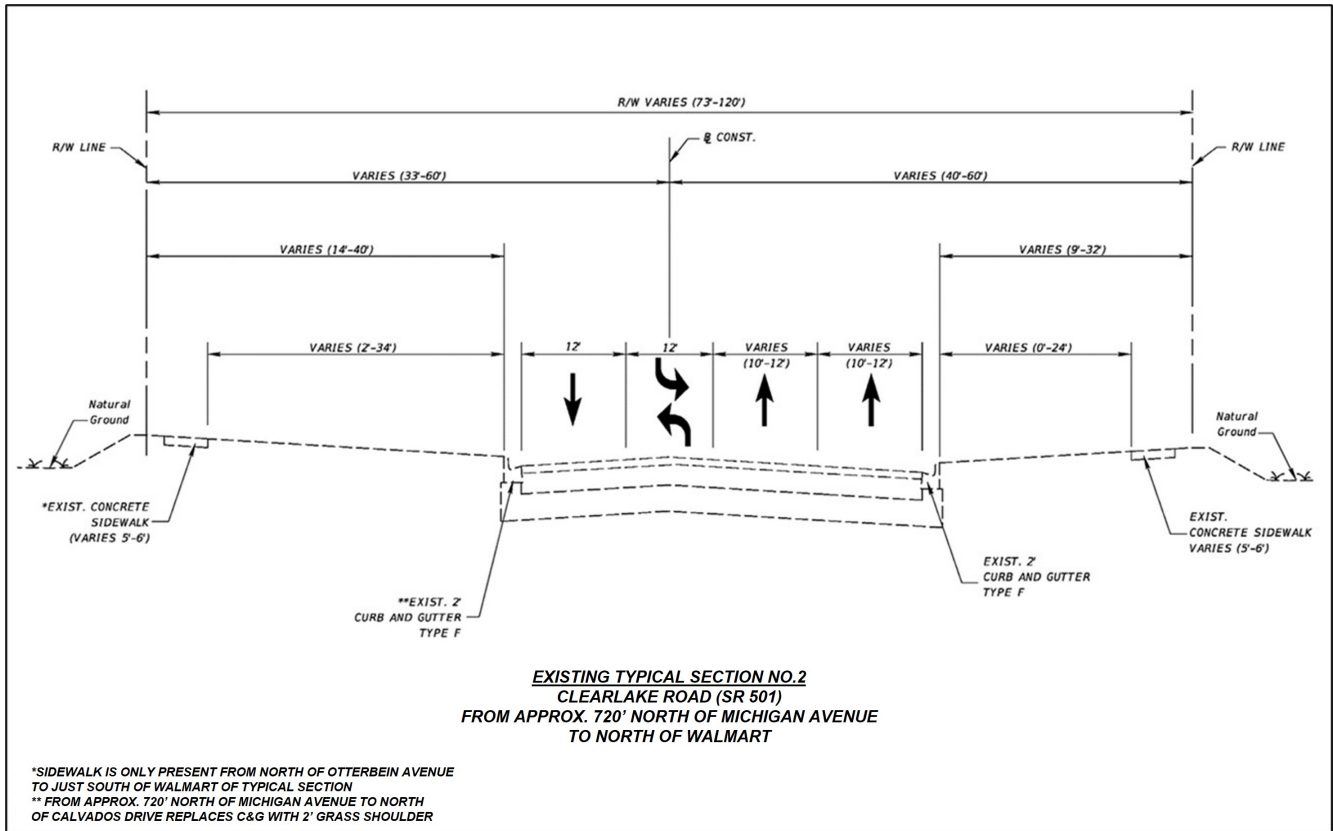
Existing Typical Section - From Approximately 720 ft North of Michigan Avenue to North of Walmart
